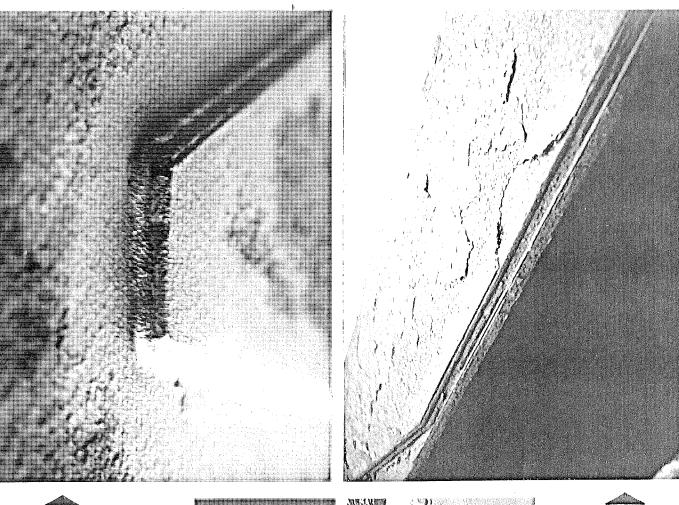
Corrosion of welded cover plate detail due to salt spraying after 14 years of service.
